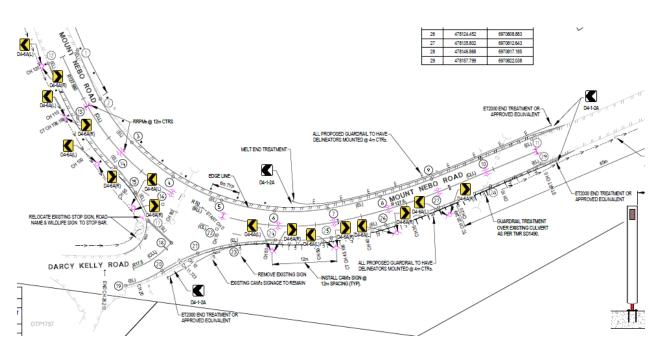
Plan section of the works, Mount Nebo Road near Darcy Kelly Road Intersection
